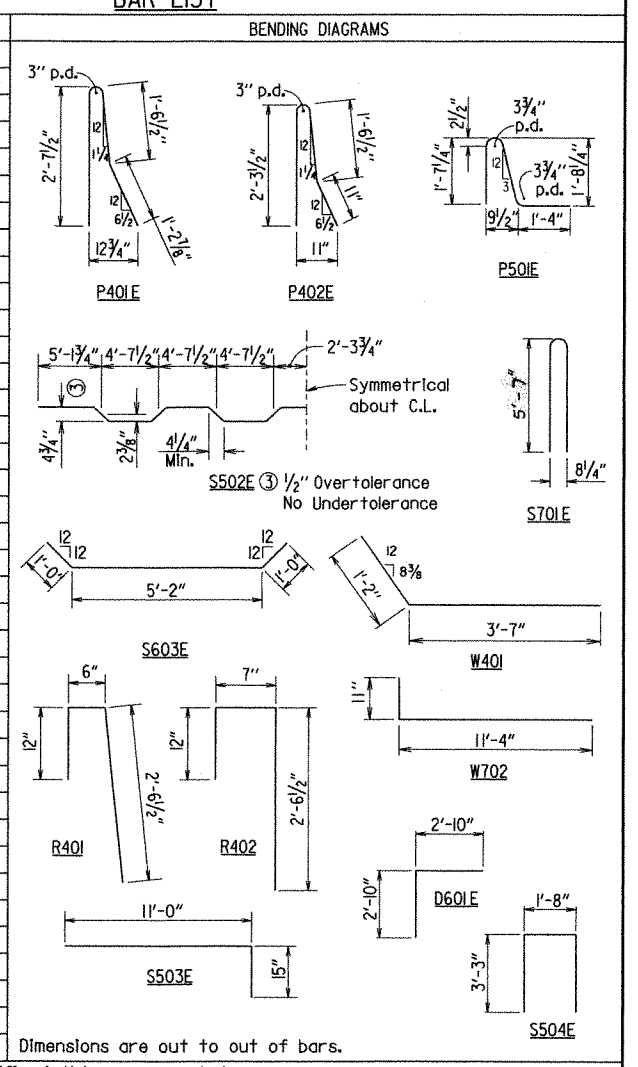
DETAILS OF OPTIONAL SLIP FORMING OF CONCRETE PARAPET RAIL
